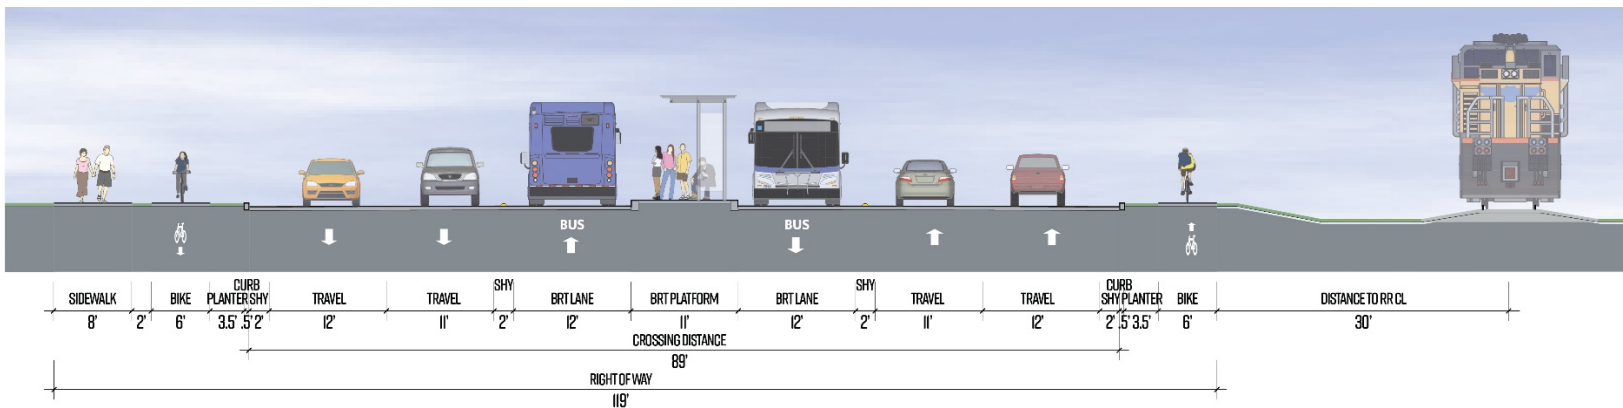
Proposed Center Station Cross Section for Center Running Transit Operation (160th Ave – 192nd Ave)
